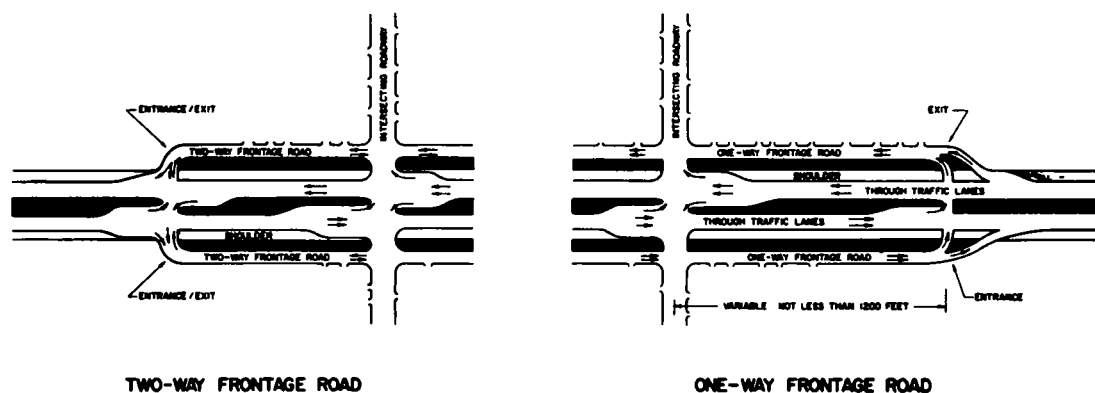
Schematic arrangement of frontage roads to serve commercial development in rural location
